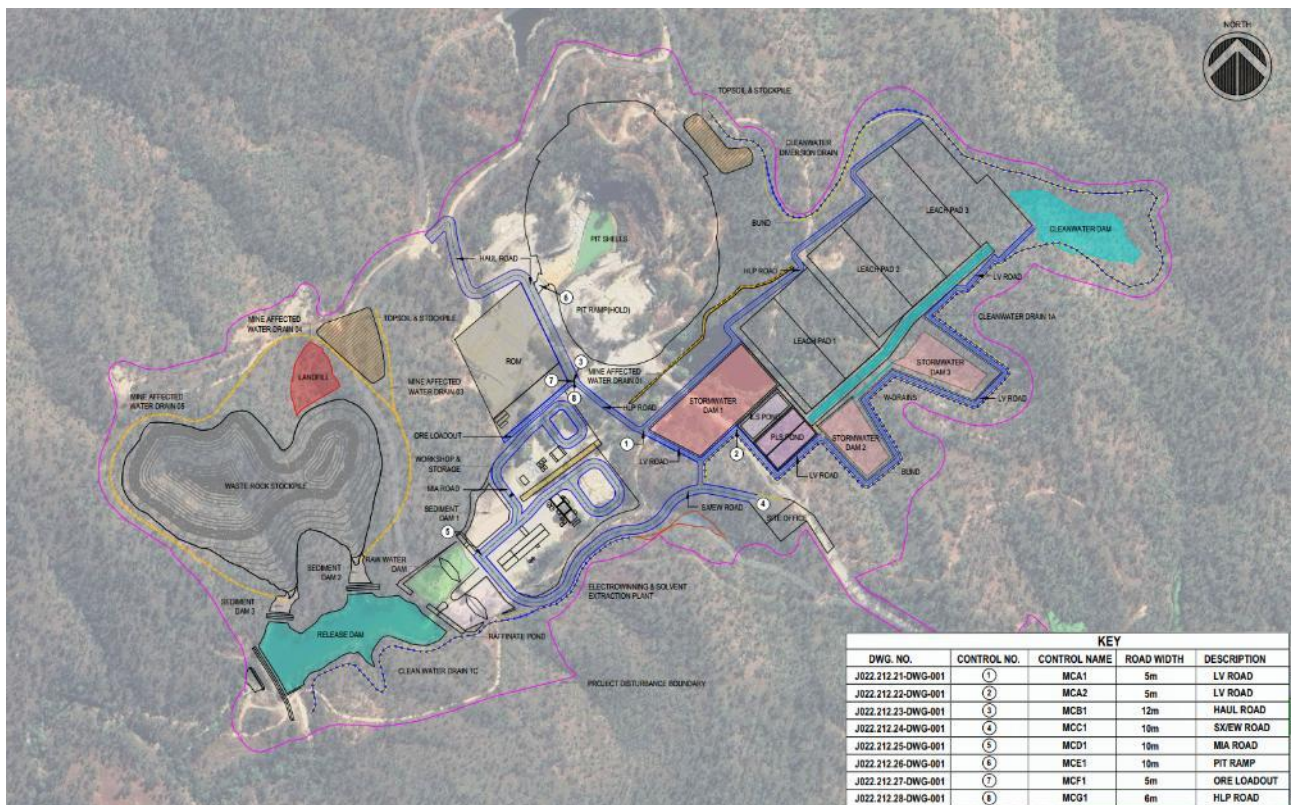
Dianne site layout with detailed road and access design (design images, construction not yet completed)
